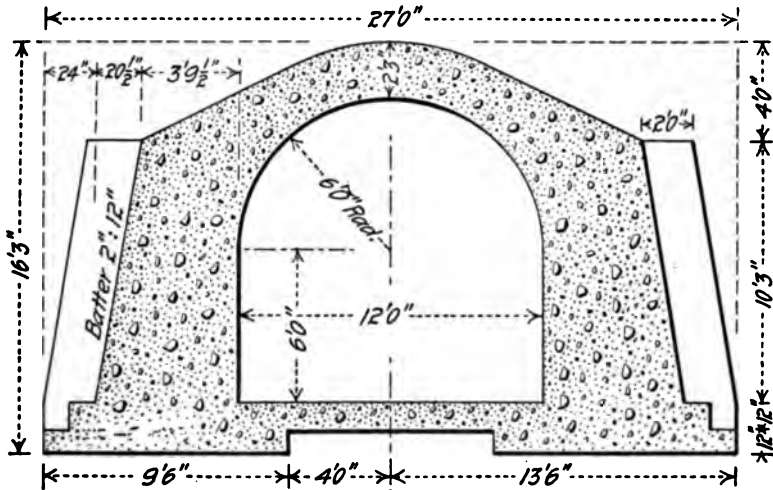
Arch Culvert, N., C. & St. L. Ry.
